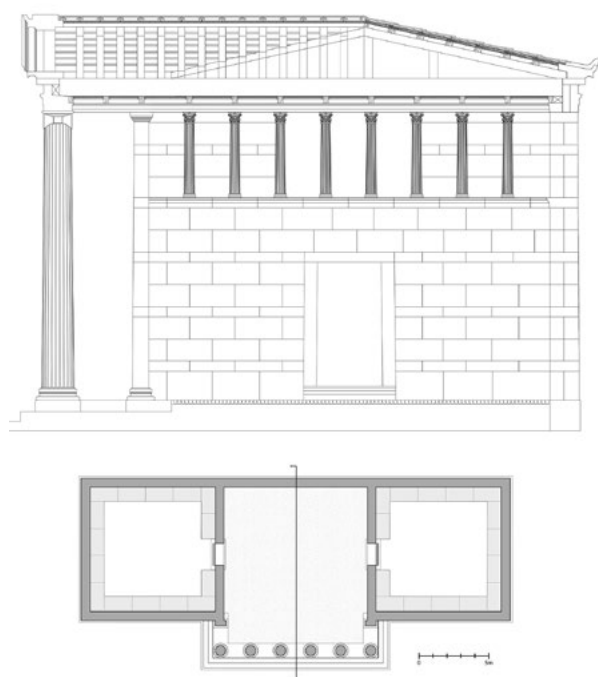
Preliminary reconstruction of the Corinthian gallery cum windows in Building M (Milesian Banquet Hall) (drawings: American Excavations Samothrace / L. Solk).
